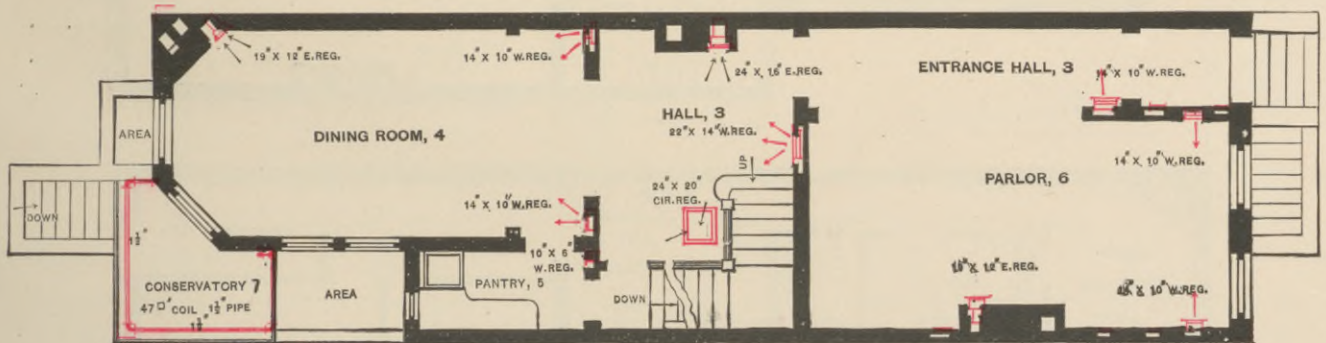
Plan of First Floor. Scale  $\frac{1}{12}$  inch to the foot.
